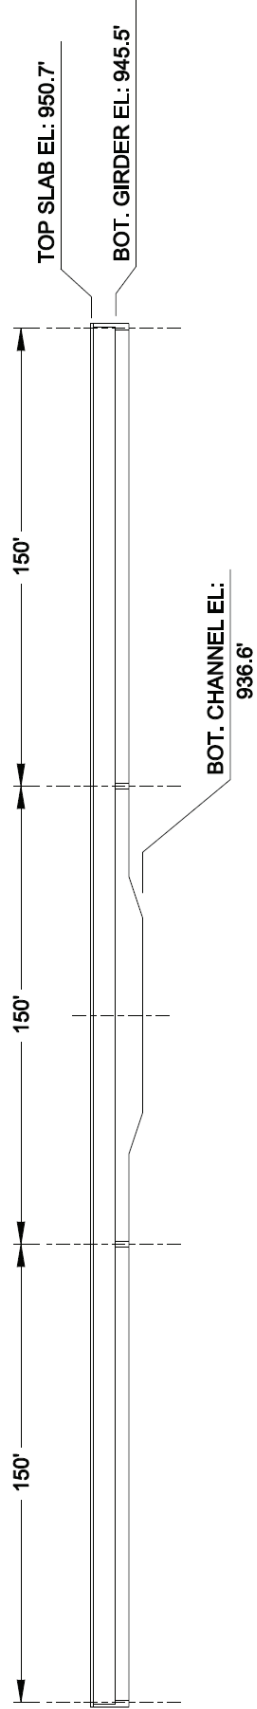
Bridge over Pomme De Terre River (2 alternatives)
